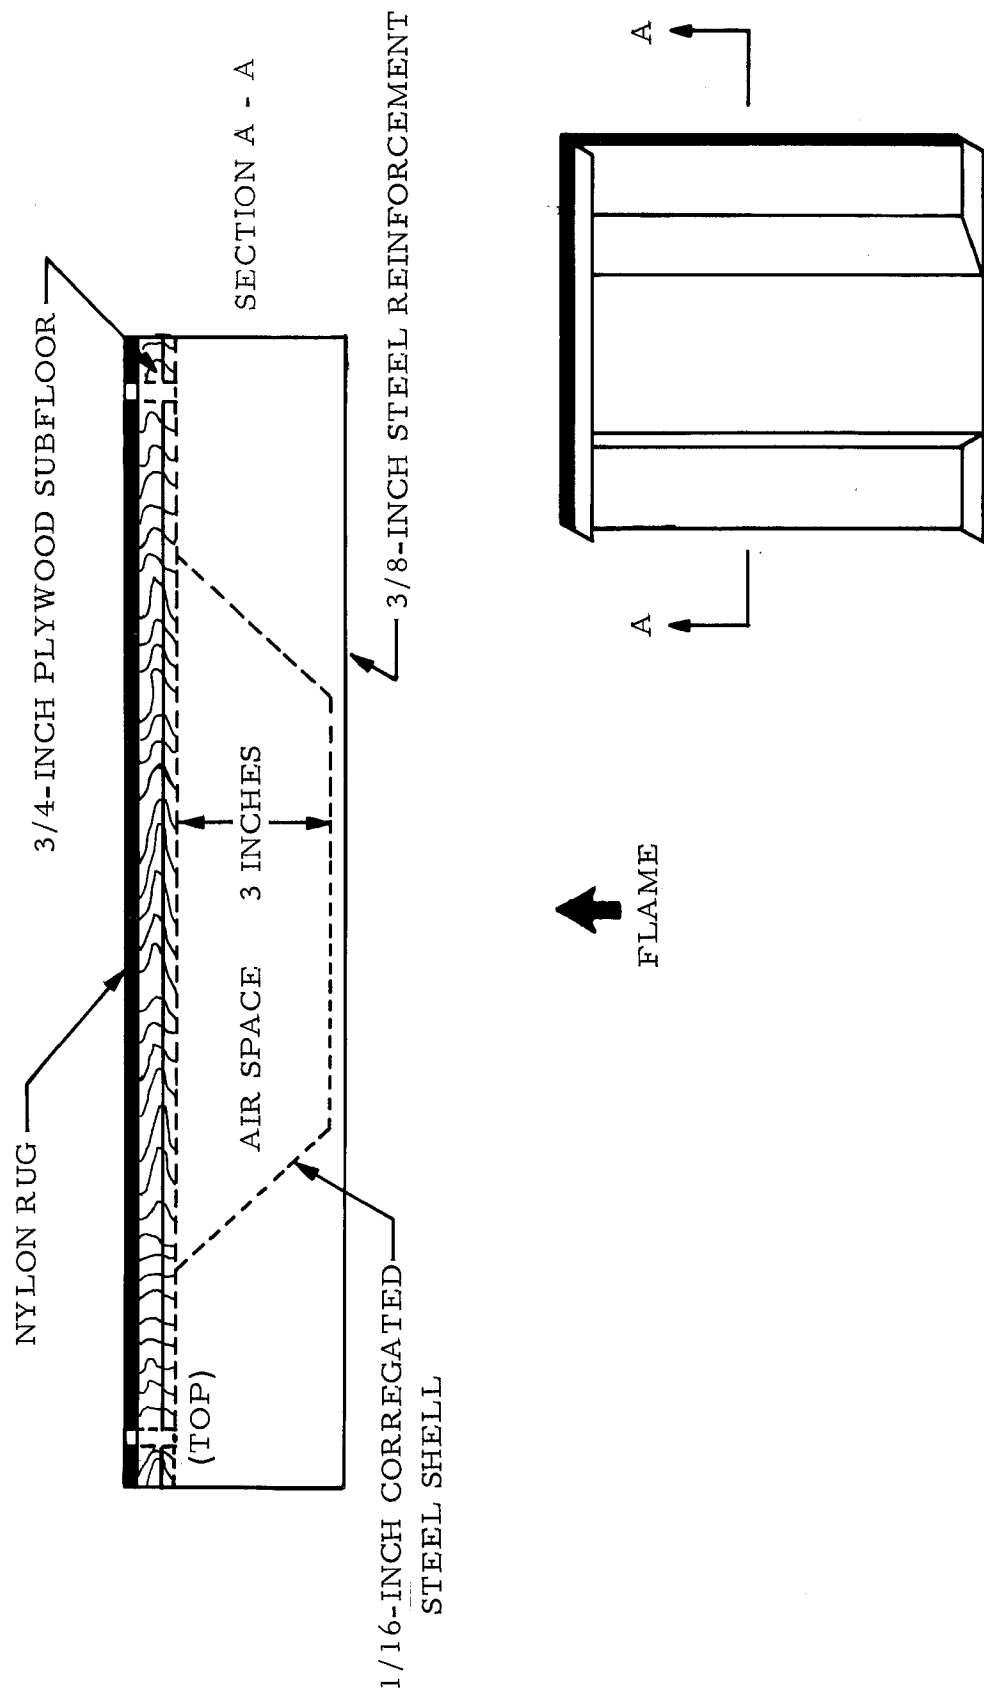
PANEL NO. 2B - SECTION VIEW OF
